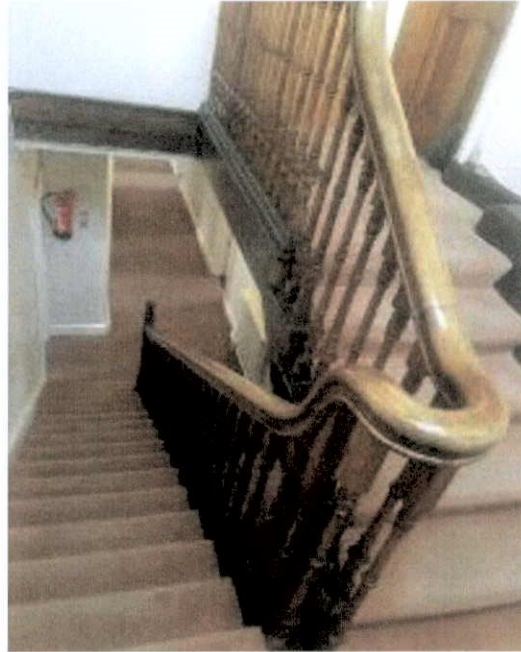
Detail of stair, hardwood handrail with swan-neck detail at landing.
